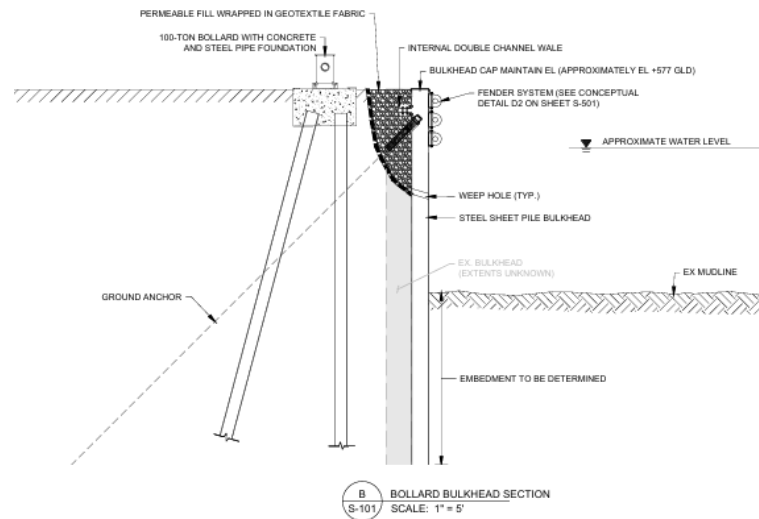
Figure Showing proposed bulkhead and bollard foundation layout
